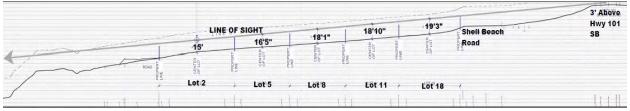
Line of Sight from Highway 101 to 15-foot-tall structures on front lots.
